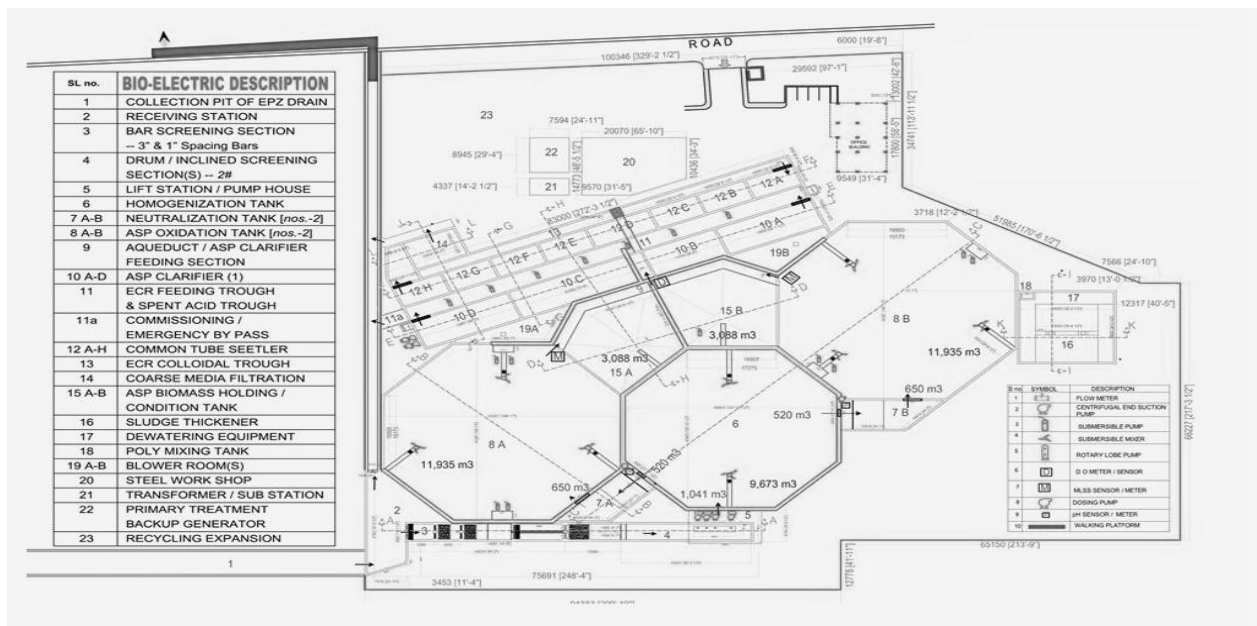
DEPZ Central Effluent Treatment Plant Detail Layout.
